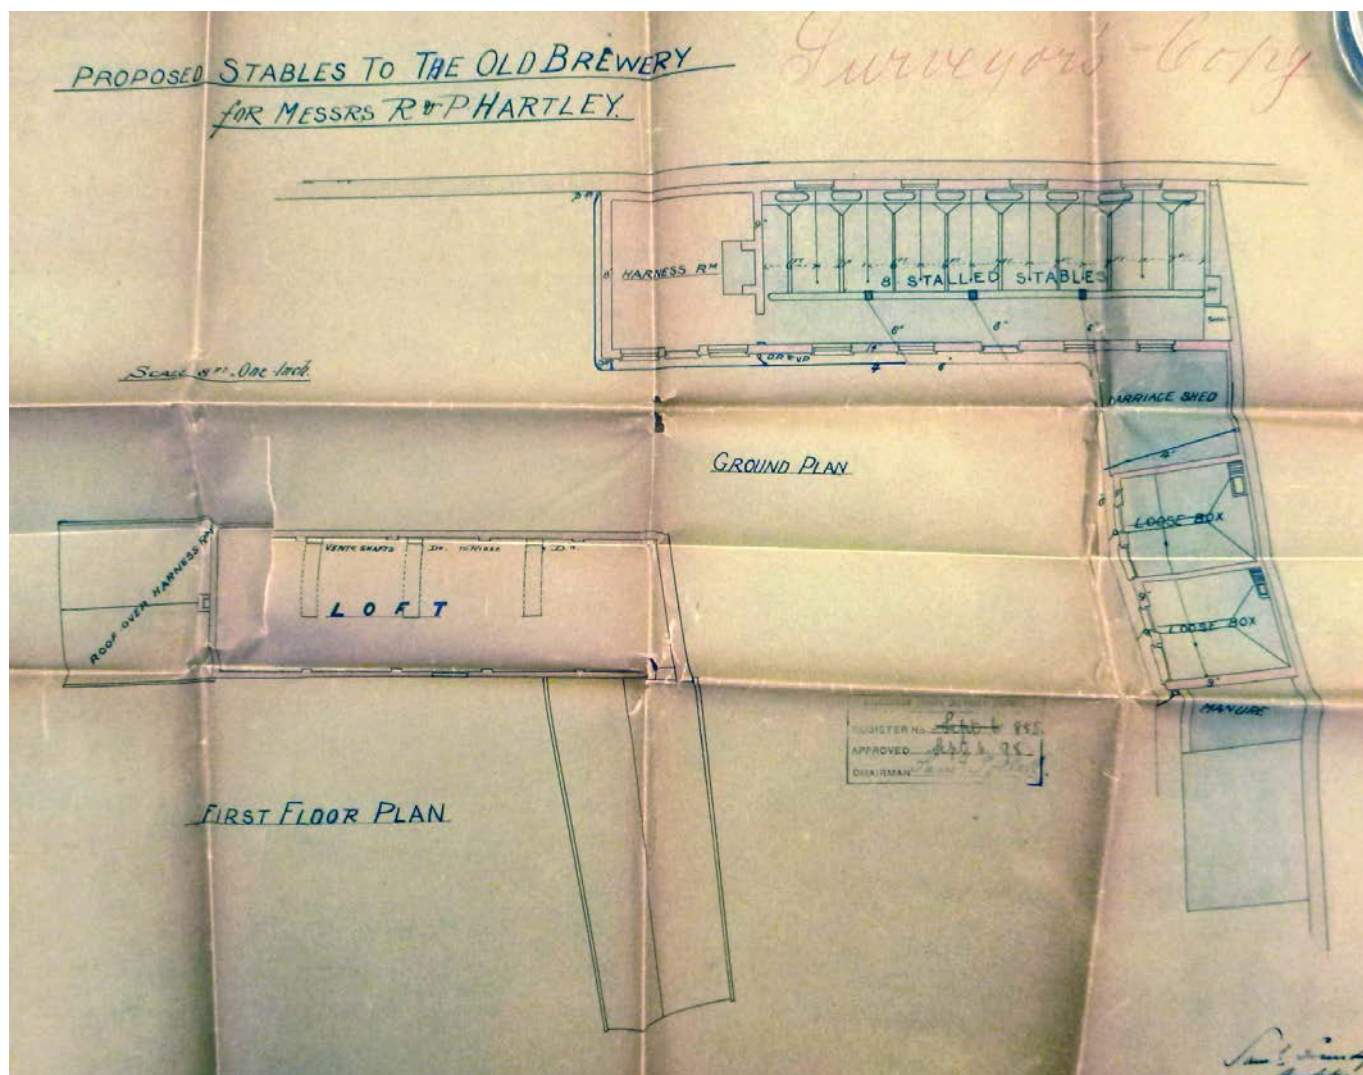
Floor plans for proposed stables to the Old Brewery, 1898
